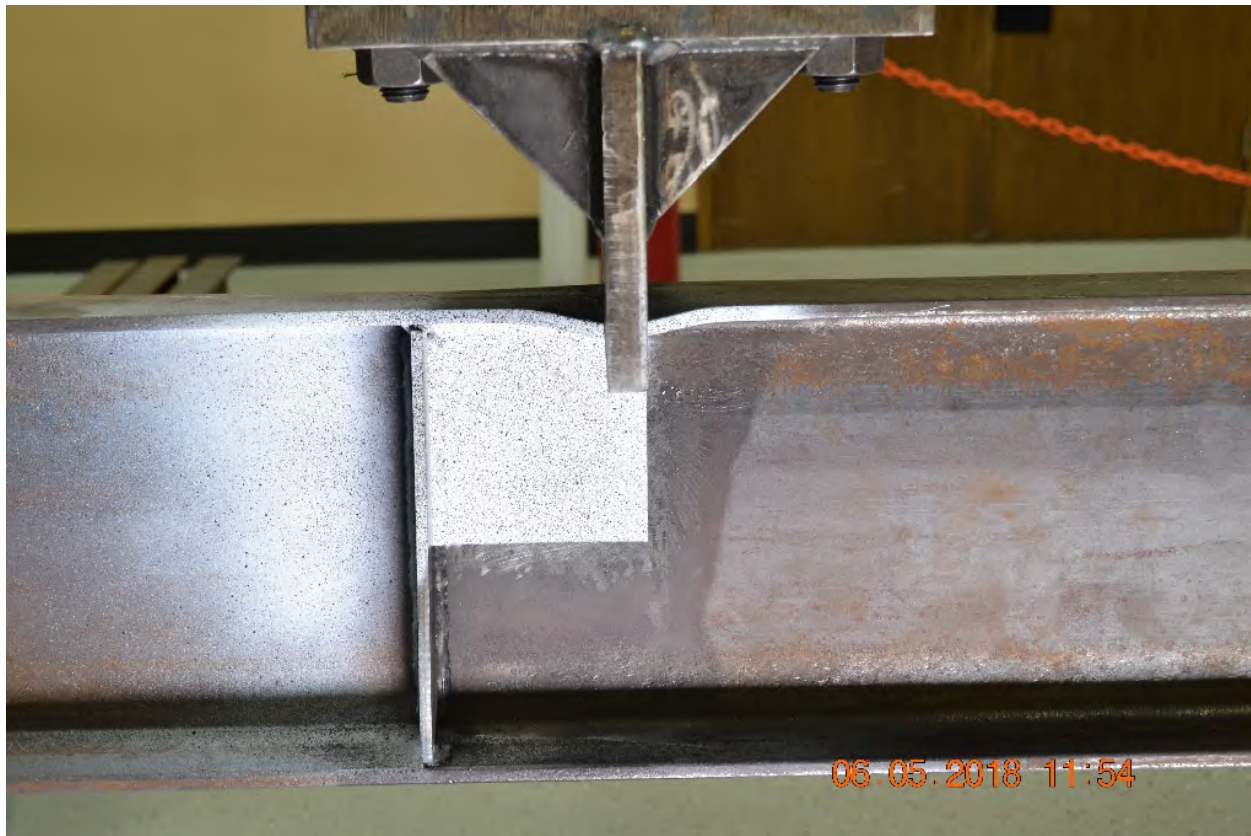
W10X19-SC-NA after testing emphasizing flange bending
